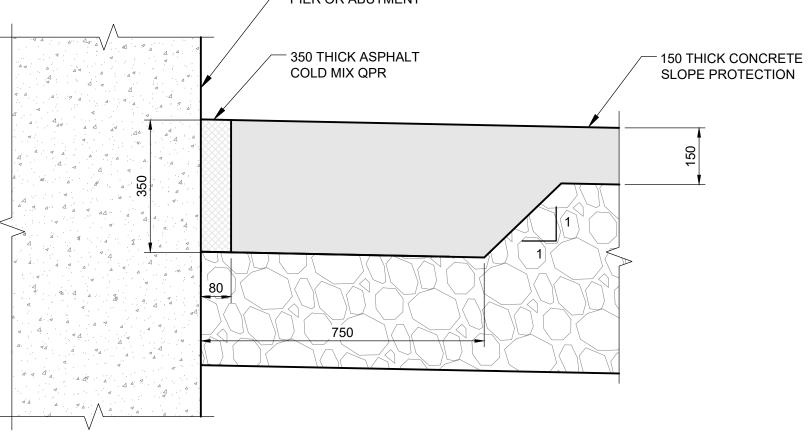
DETAIL - CONSTRUCTION JOINT TYPE "J1"
